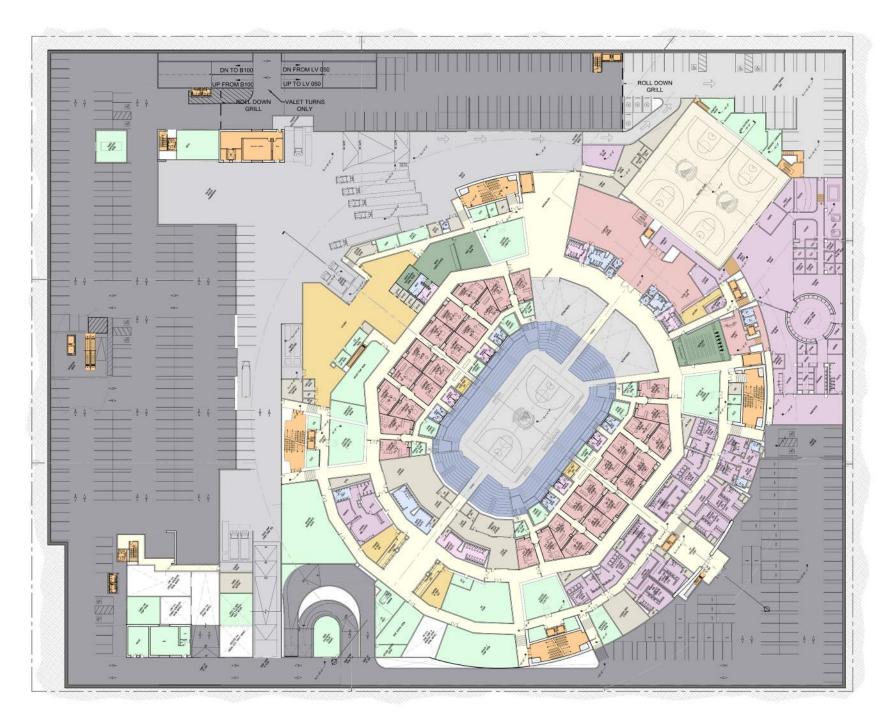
Subgrade Parking Level 1: Middle parking level and loading dock level, located at -10'0"
